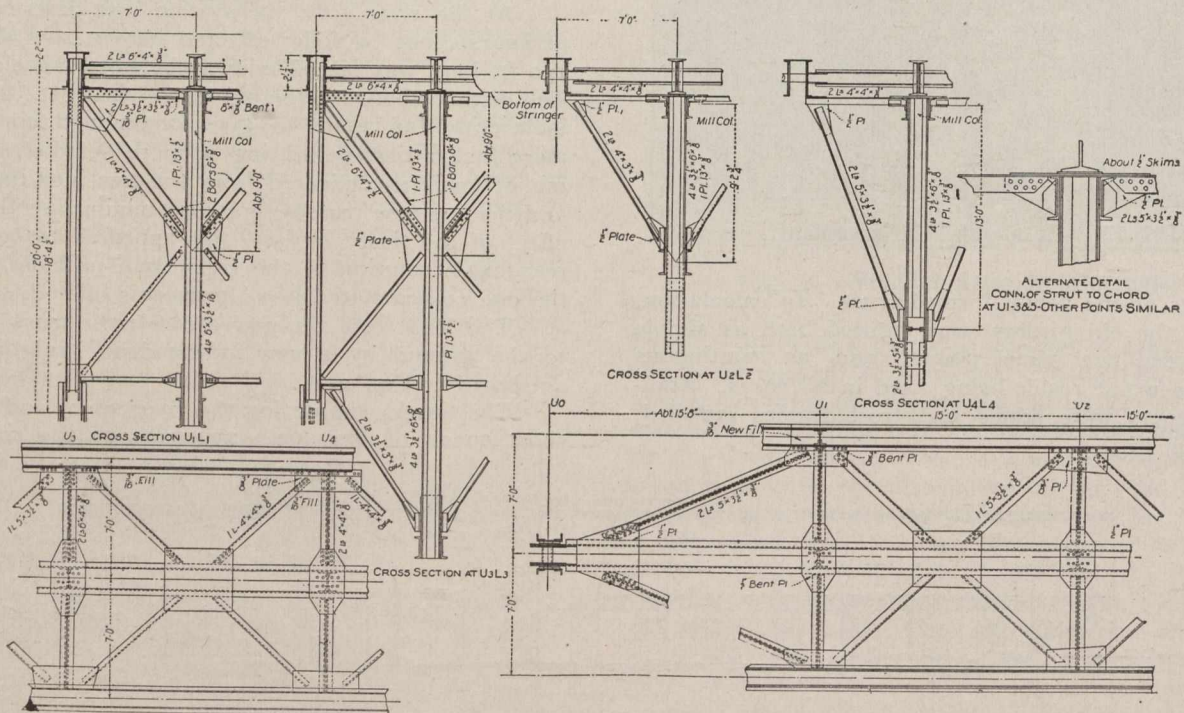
Cross Frames and Hangers Between Old and New Trusses.
